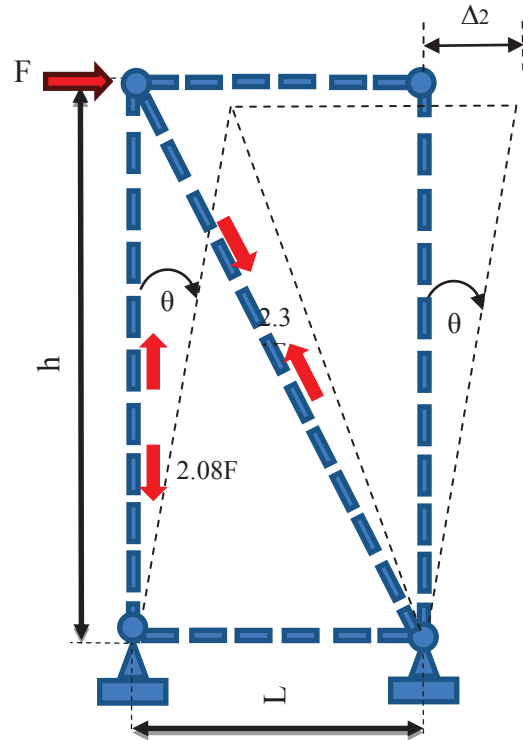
Loaded and unloaded state of diagonal bracing wall unit.
